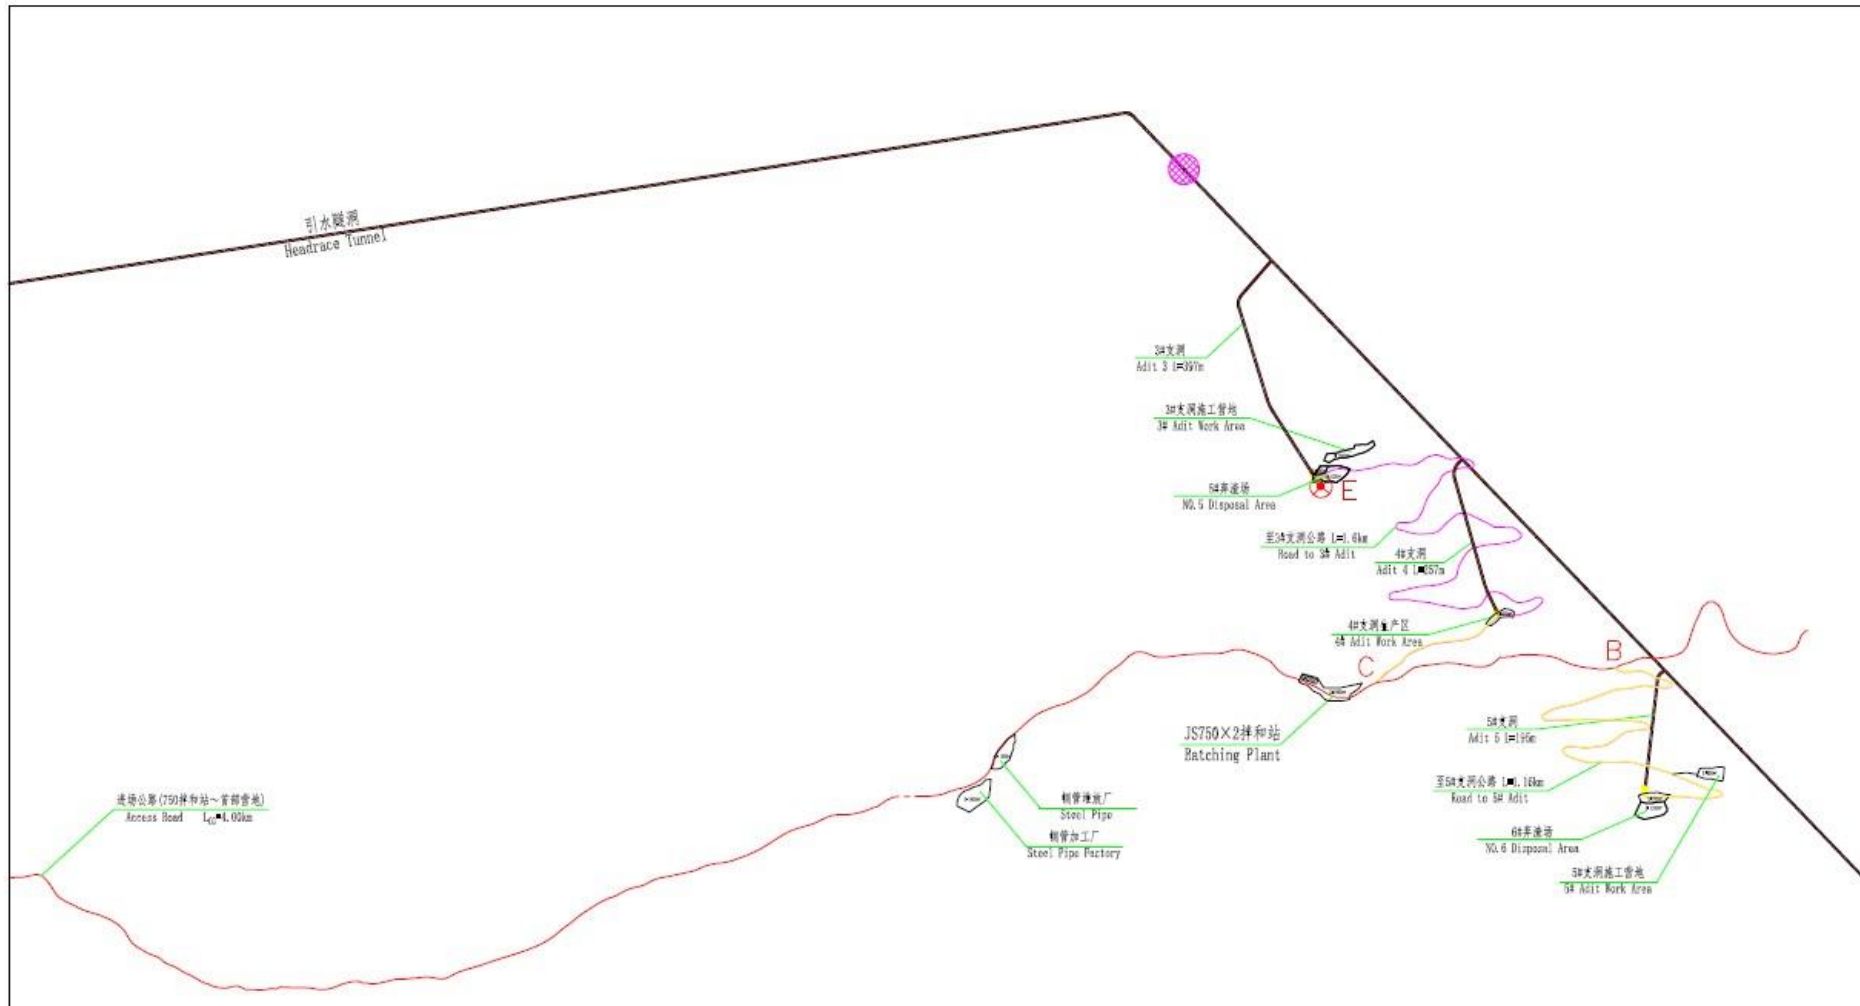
General Project Layout (Source: Detail Design Report 2021)
